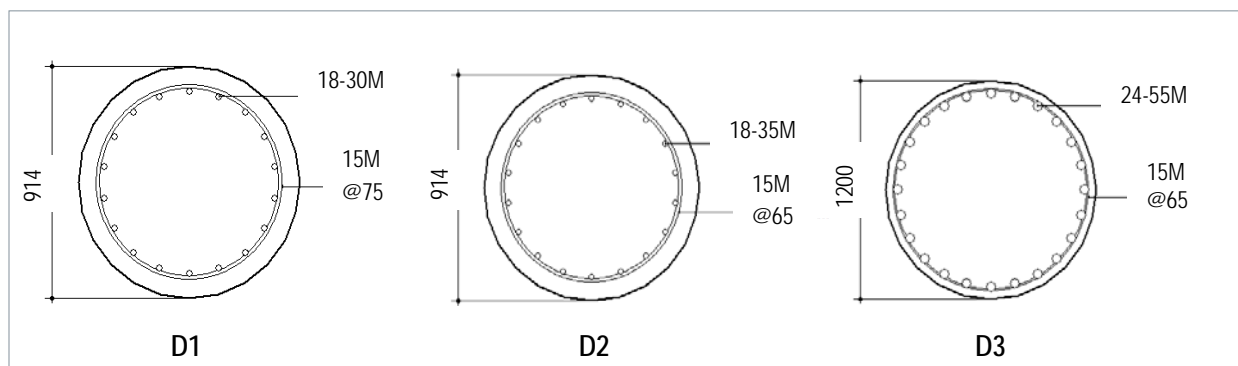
7: Column section (adapted from Zhang et al. 2016)
